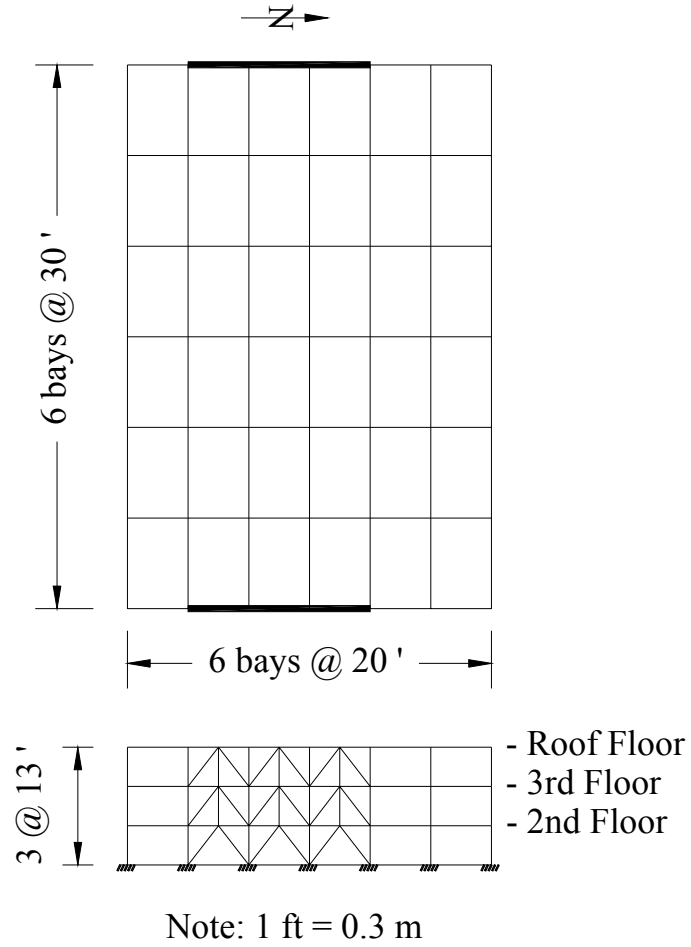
Floor plan and elevation for the 3-story SAC model building modified with zipper-braced system.
